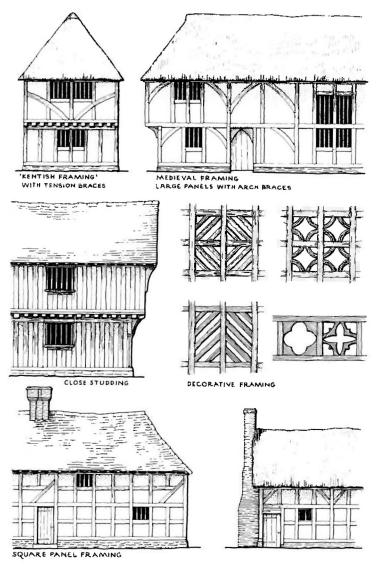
Patterns of Wall Framing. Source: R Harris -Discovering Timber Framed Buildings
